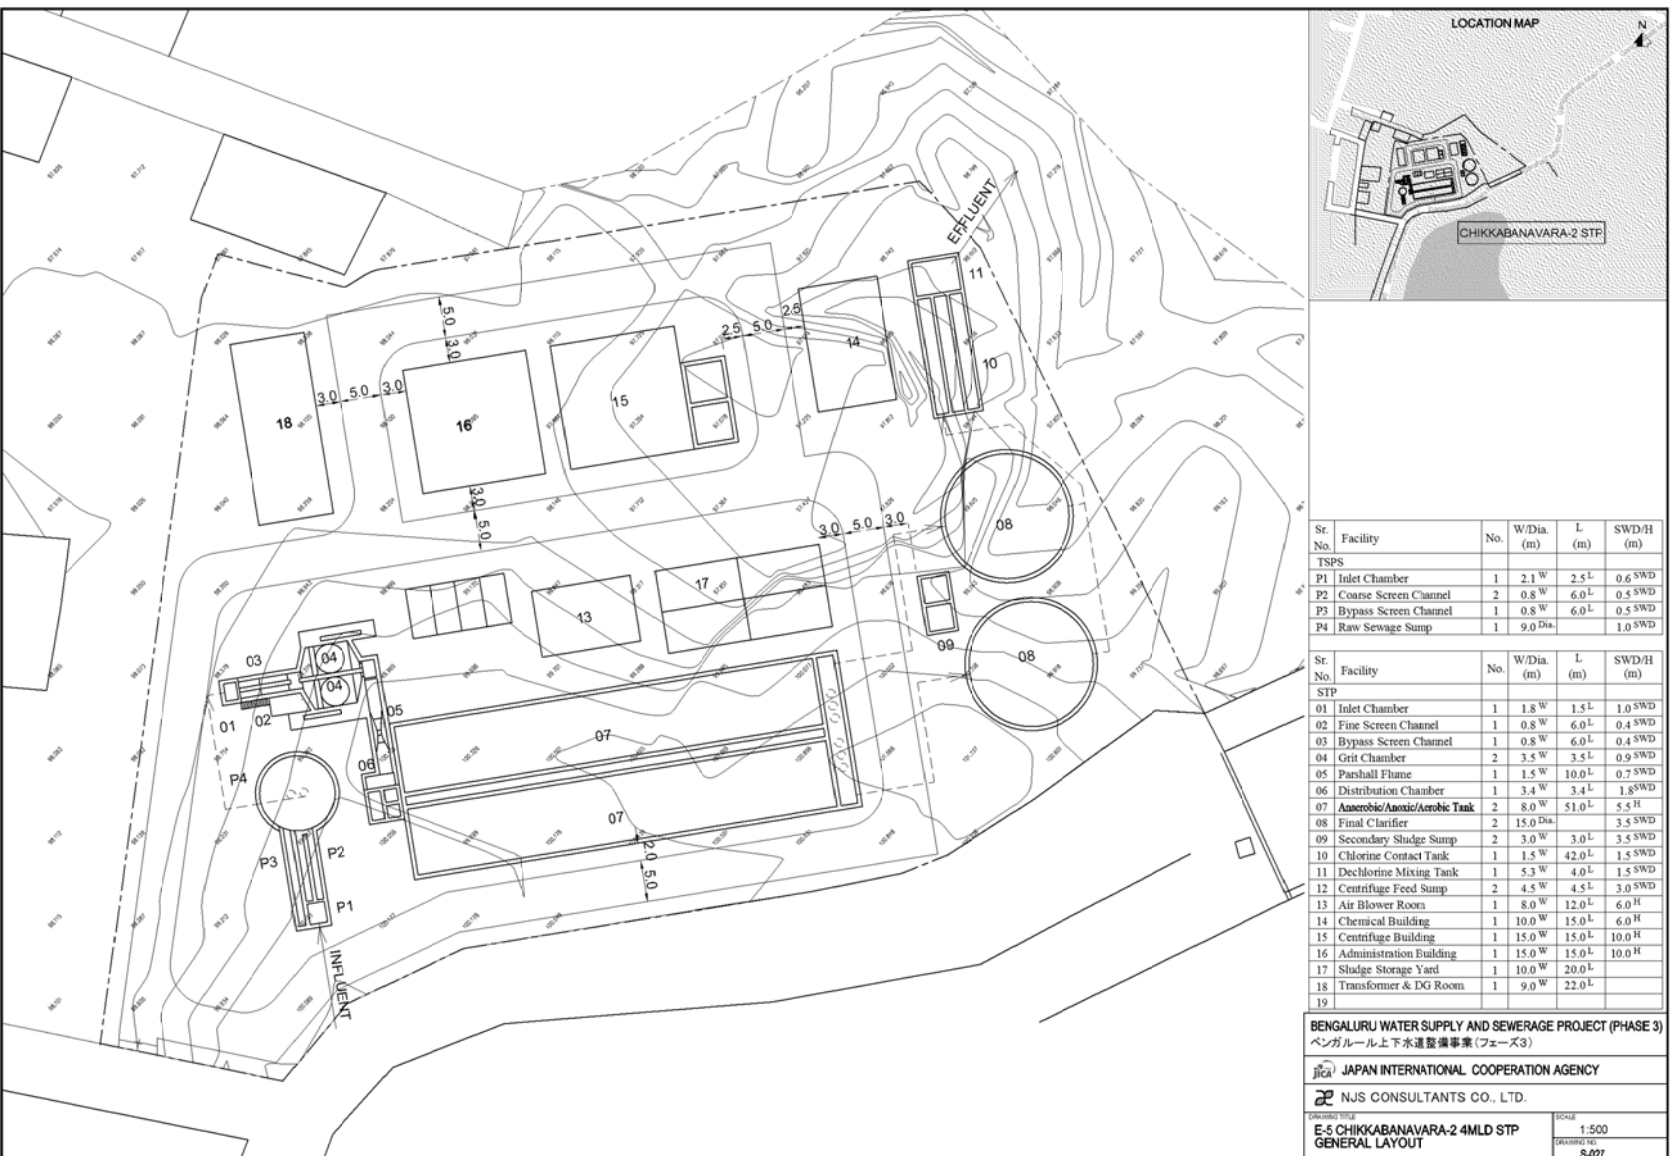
Layout plan of Chikkabanavara-2 STP
